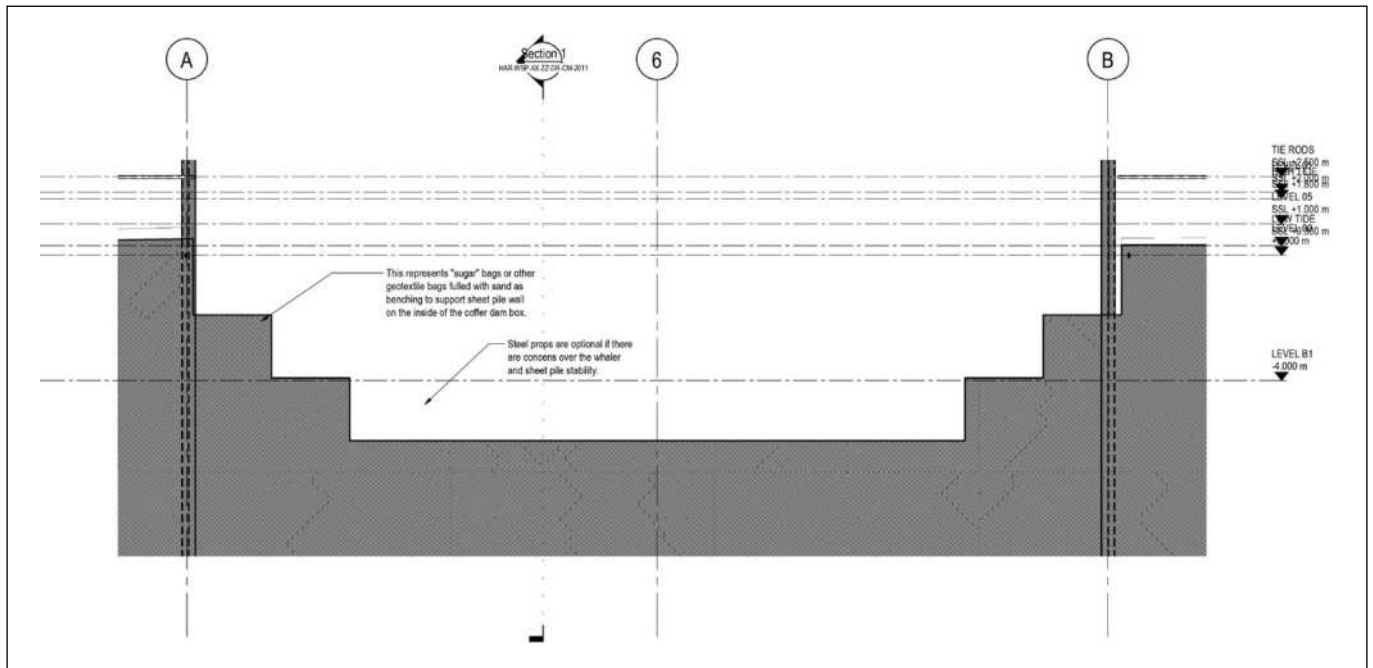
Section A-B across the width of the excavation facility (refer to Figure 3)
